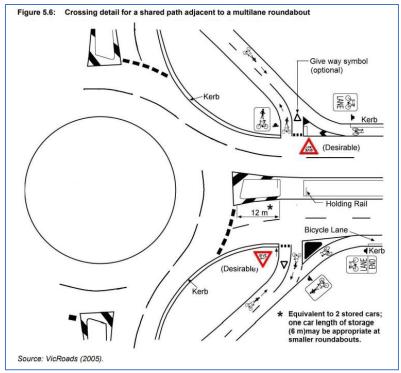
for multilane roundabouts from Austroads Guide to Road
